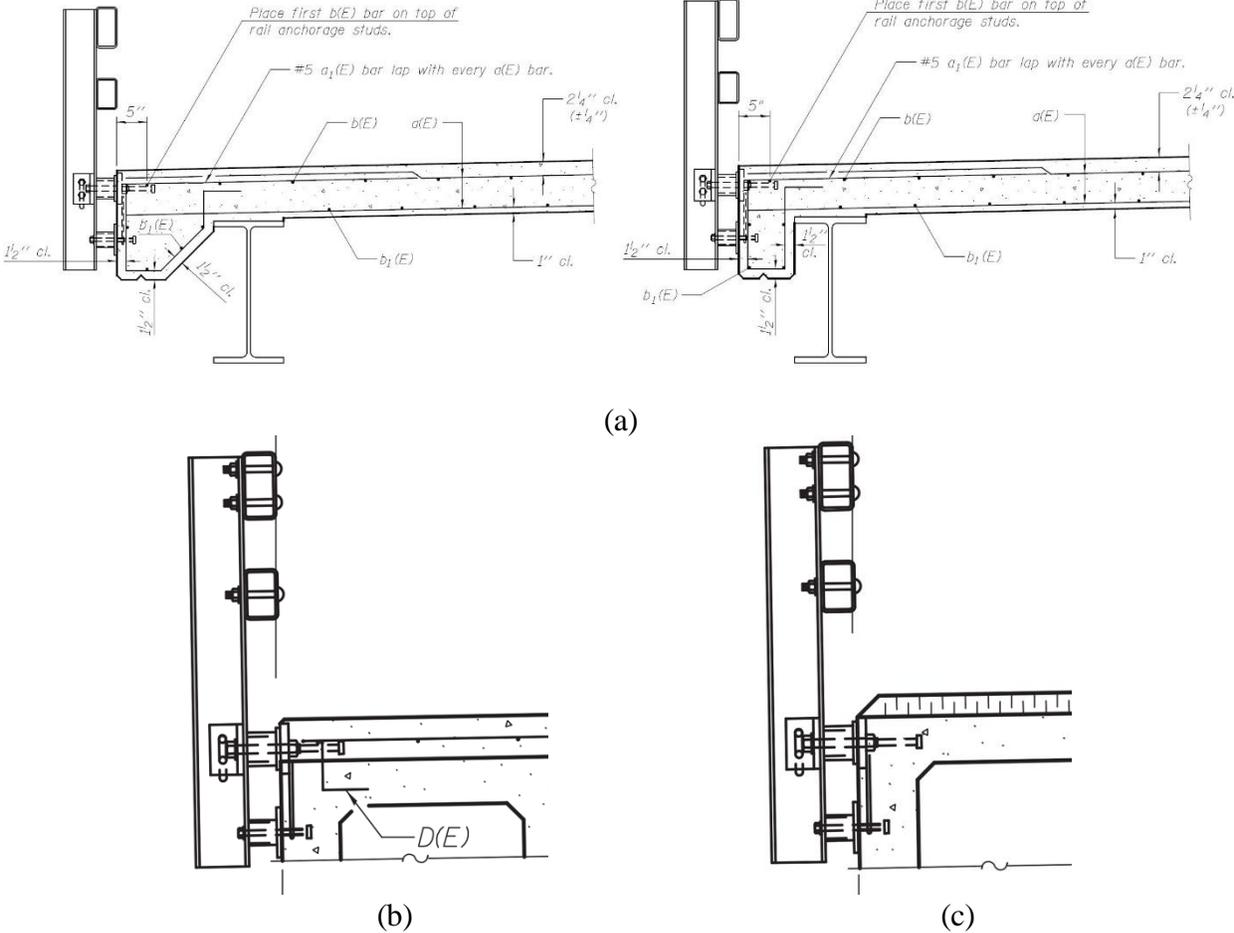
IDOT (a) Bridge Slab, (b) Box Girder with Concrete Wearing Surface, and (c) Box Girder with Asphalt Wearing Surface [2]
